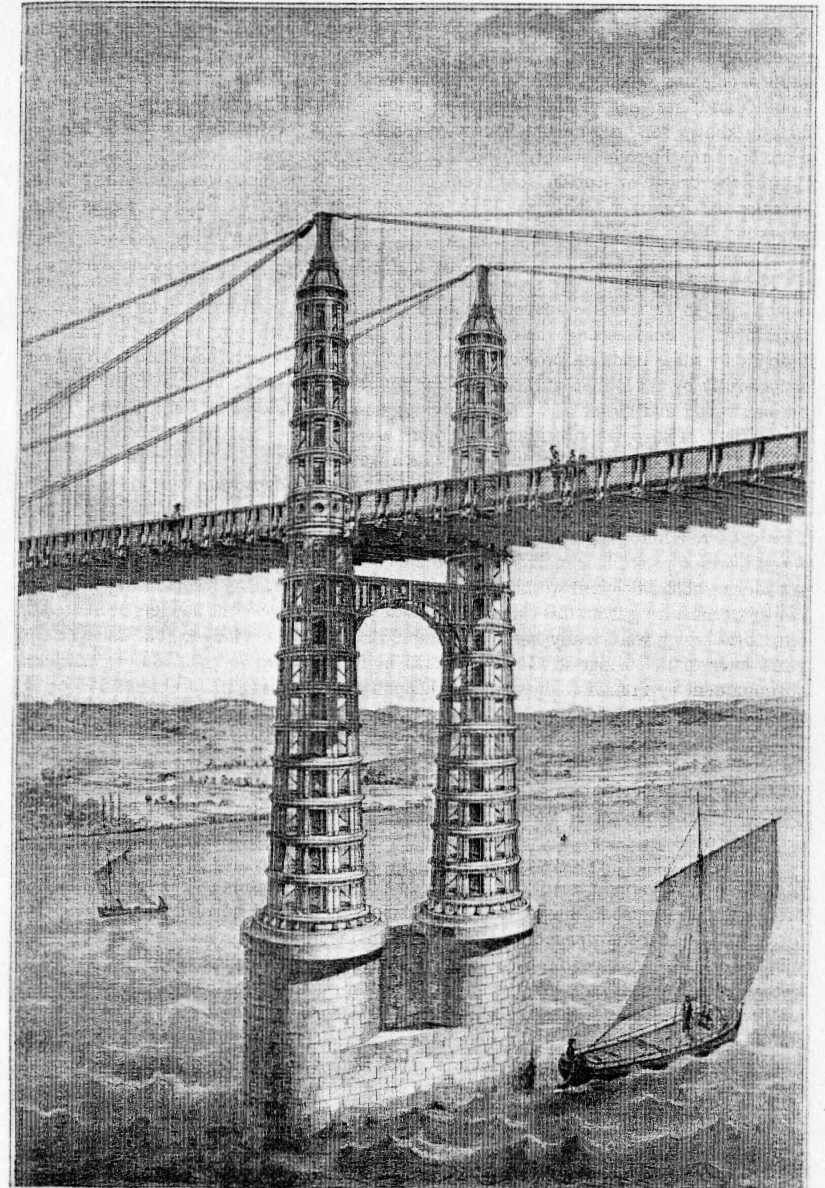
E. MARTIN: Piers of the Cubzac bridge.
